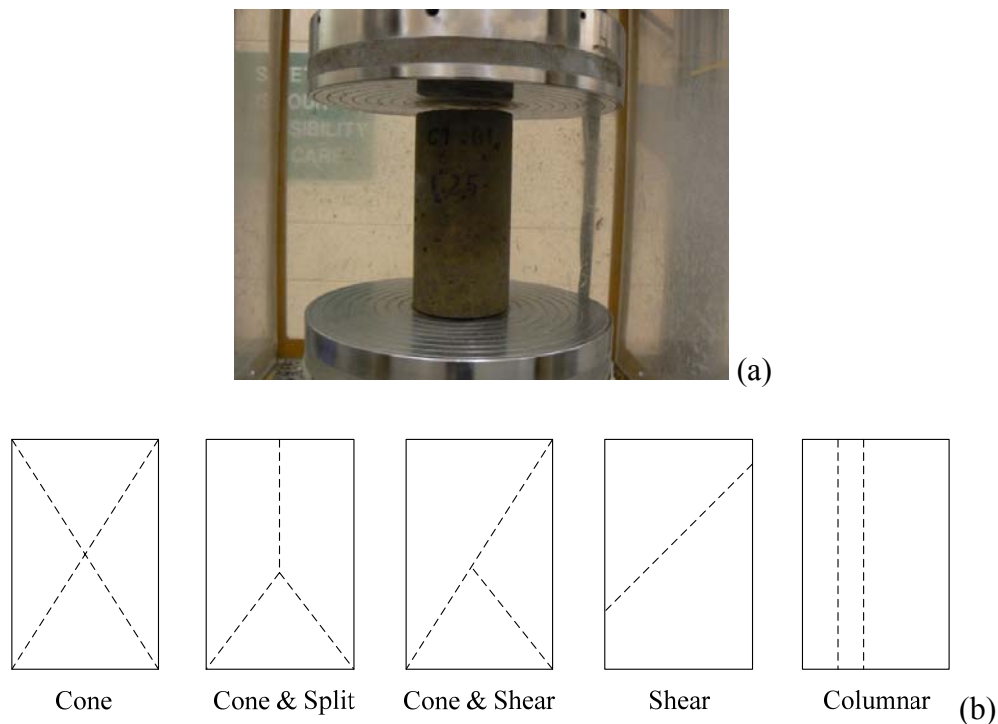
Compressive test on the concrete samples, (a) MTS machine, (b) failure patterns.
